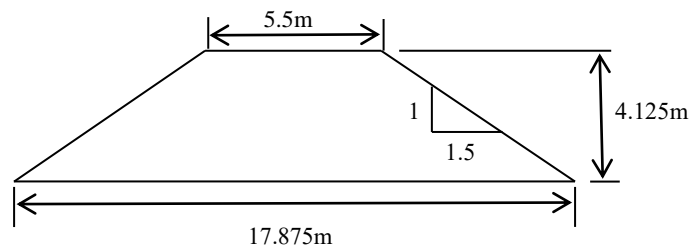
LGED rural road section through hills, Road Type B (LGED, 2005)
